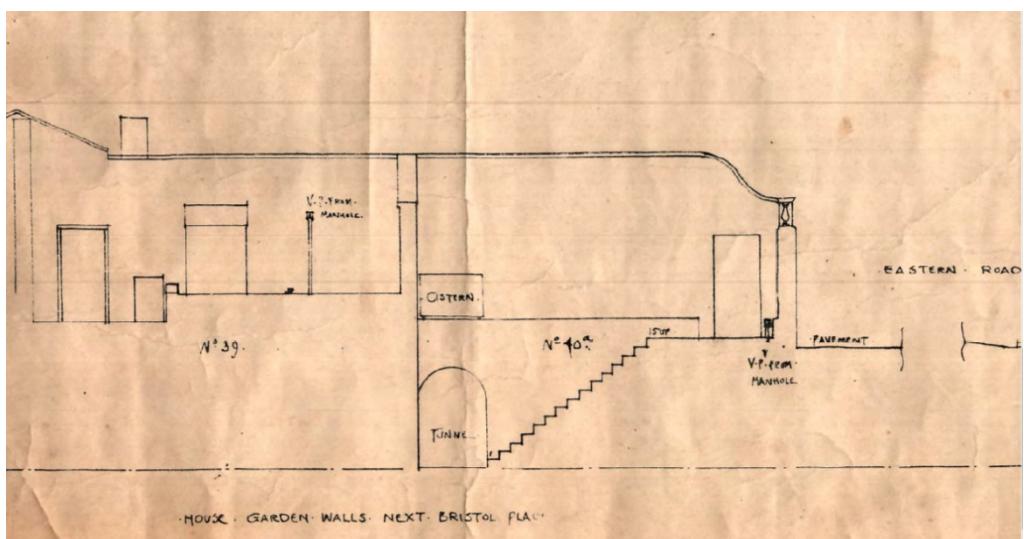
Lutyens' sketch of the rear eastern wall and tunnel in 1918.
